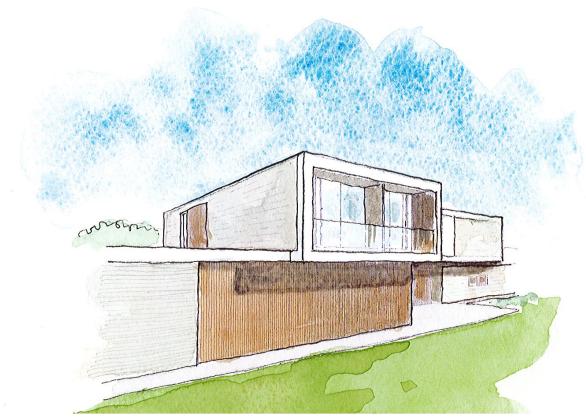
NEW FARM HOUSE FRONT ELEVATION
